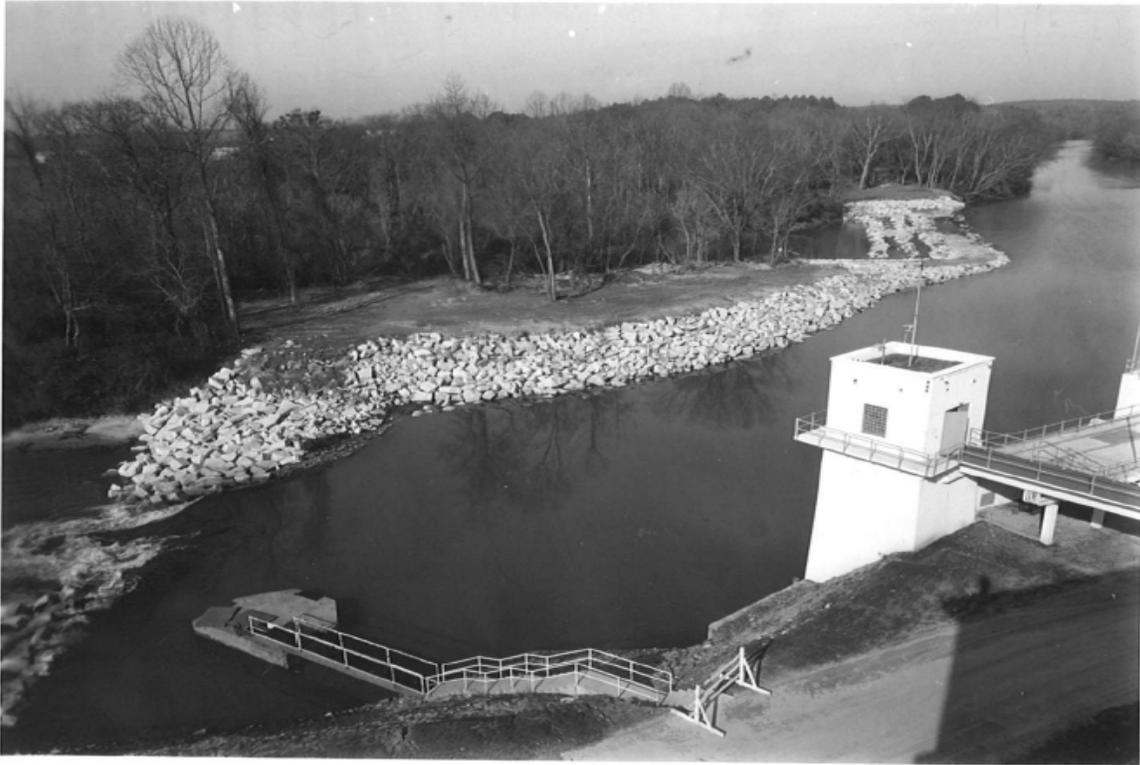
Current view of lower sill from the Chattahoochee Raw Water Intake Facility.
